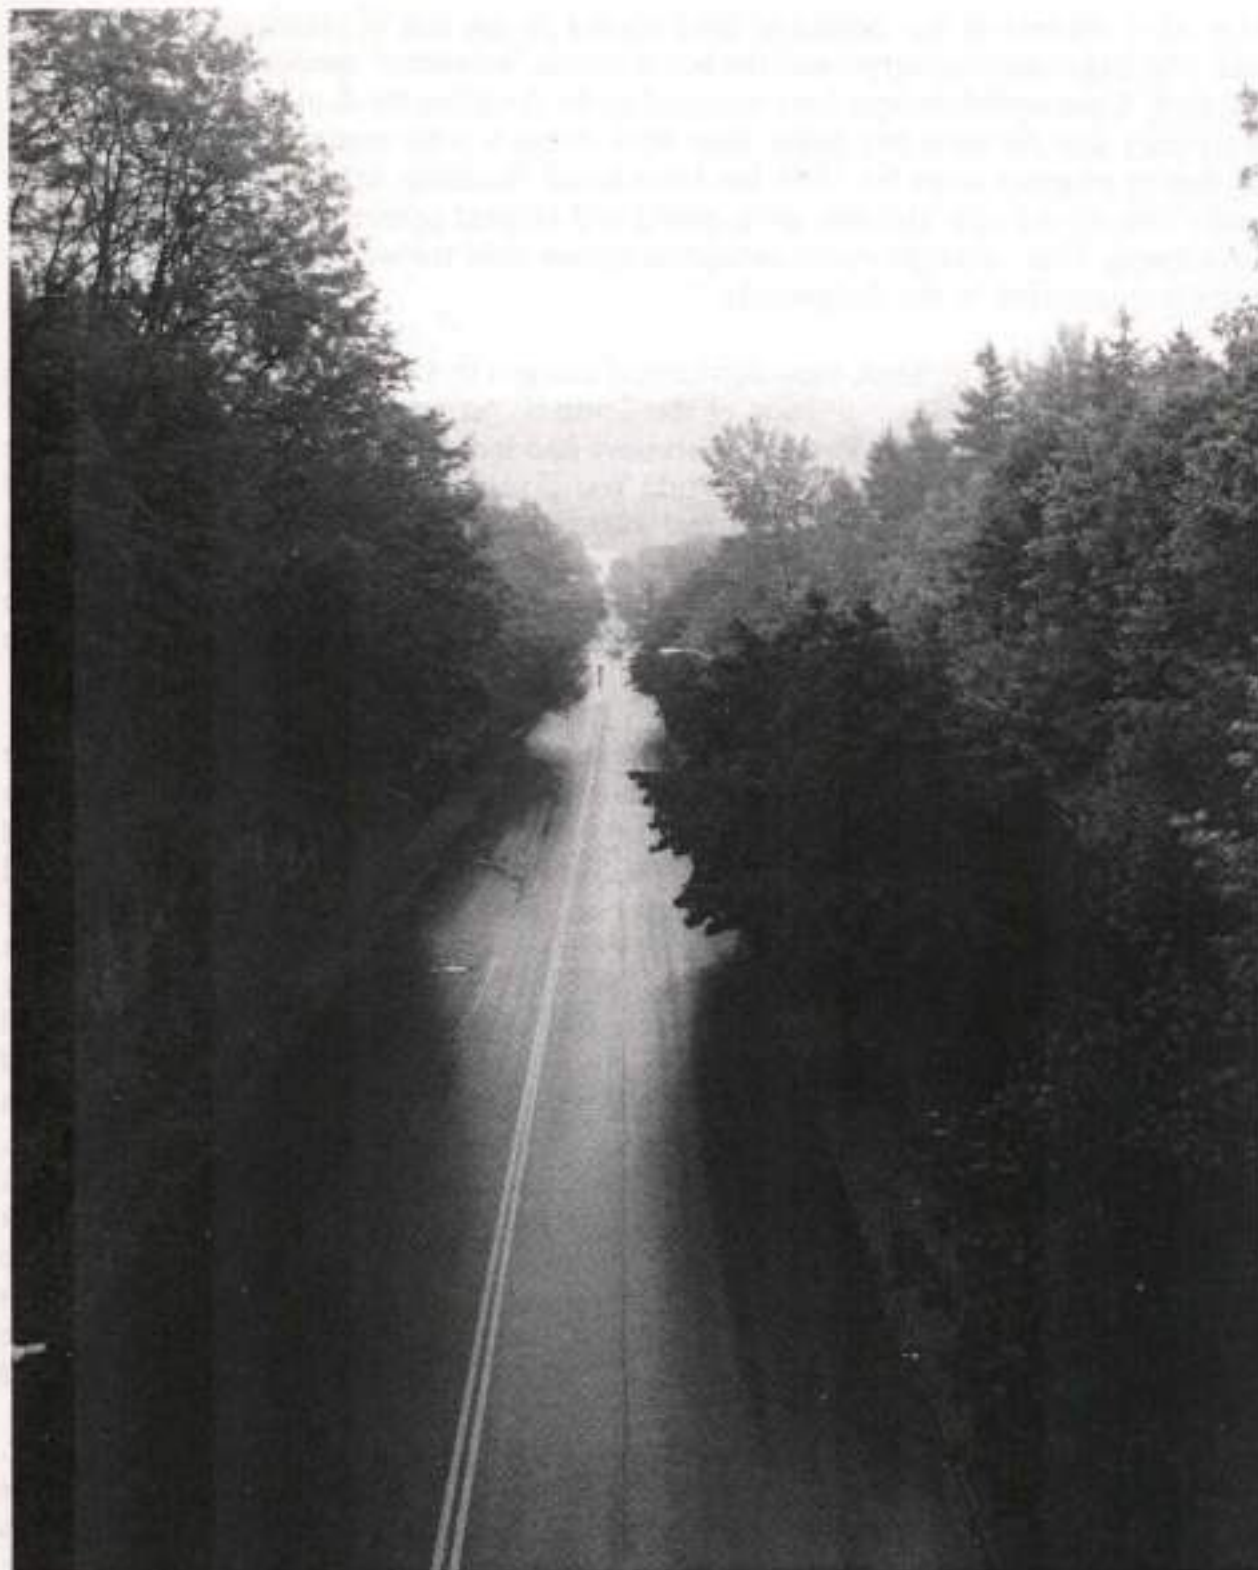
View of South Street cut from Carpenter Avenue bridge. LANDSCAPES
